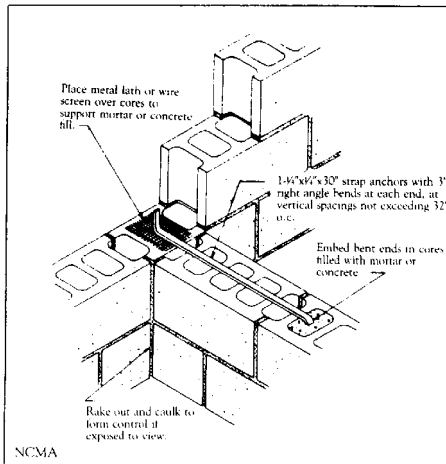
Where loadbearing walls intersect, tie them together with metal tie bars. This provides the tensile and shear strength of a true masonry bond, but allows for some movement at the joint.
